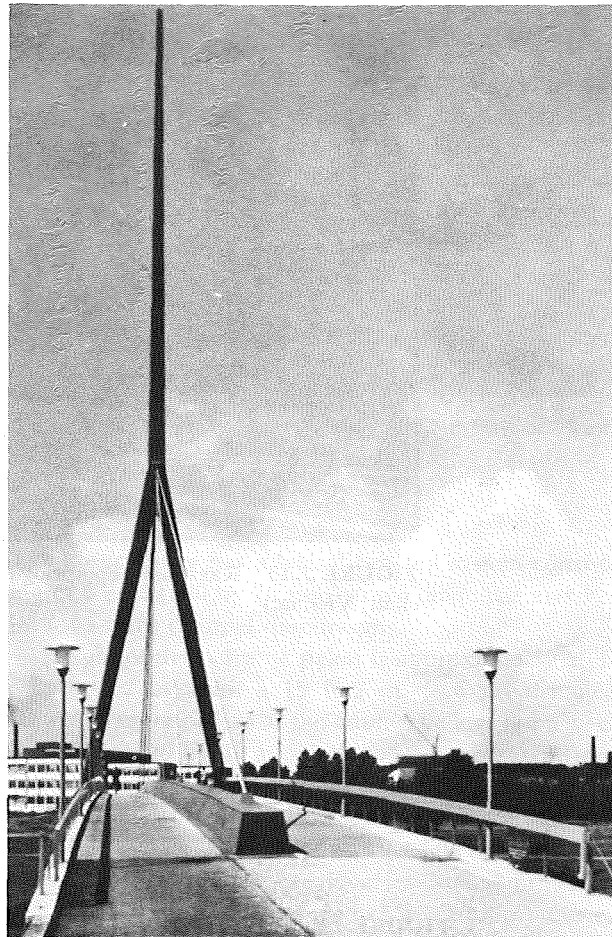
Glacischaussee Footbridge, view of pylon anchorage. (Courtesy of the British Constructional Steelwork Association, Ltd., from reference 6.)
